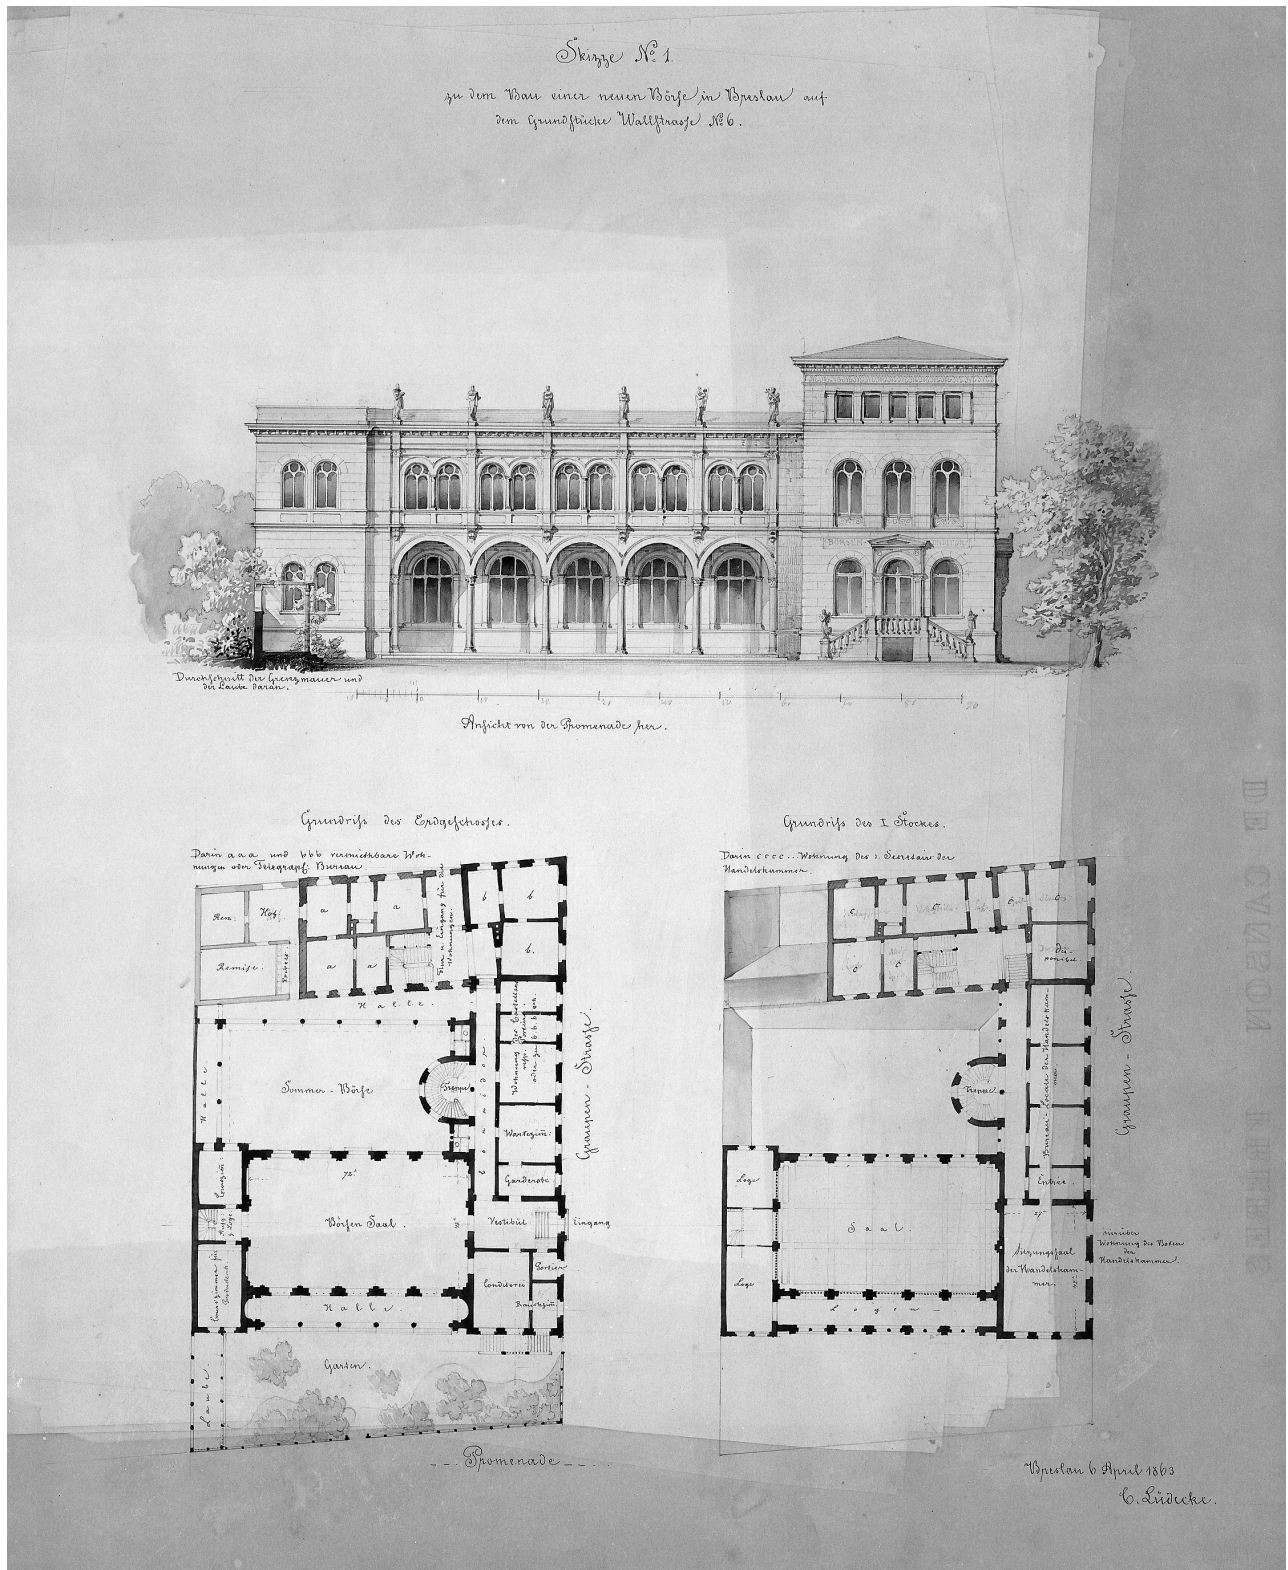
C. J. B. Lüdecke, Exchange, façade from the side of the promenade, ground and 2nd floor plan, 6 IV 1863; AMTUB, inv. no. 6692, labelled as: Carl Johann Bogislaw Lüdecke, Börse, Breslau. 2. Design. Photo: <http://architekturmuseum.ub.tu-berlin.de/index.php?p=79&POS=10> (access date: 20 II 2020)
